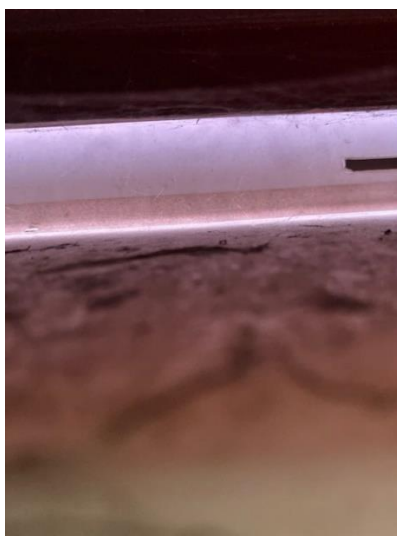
Location 1.3 - looking up showing that there is no cavity barrier surrounding the window
